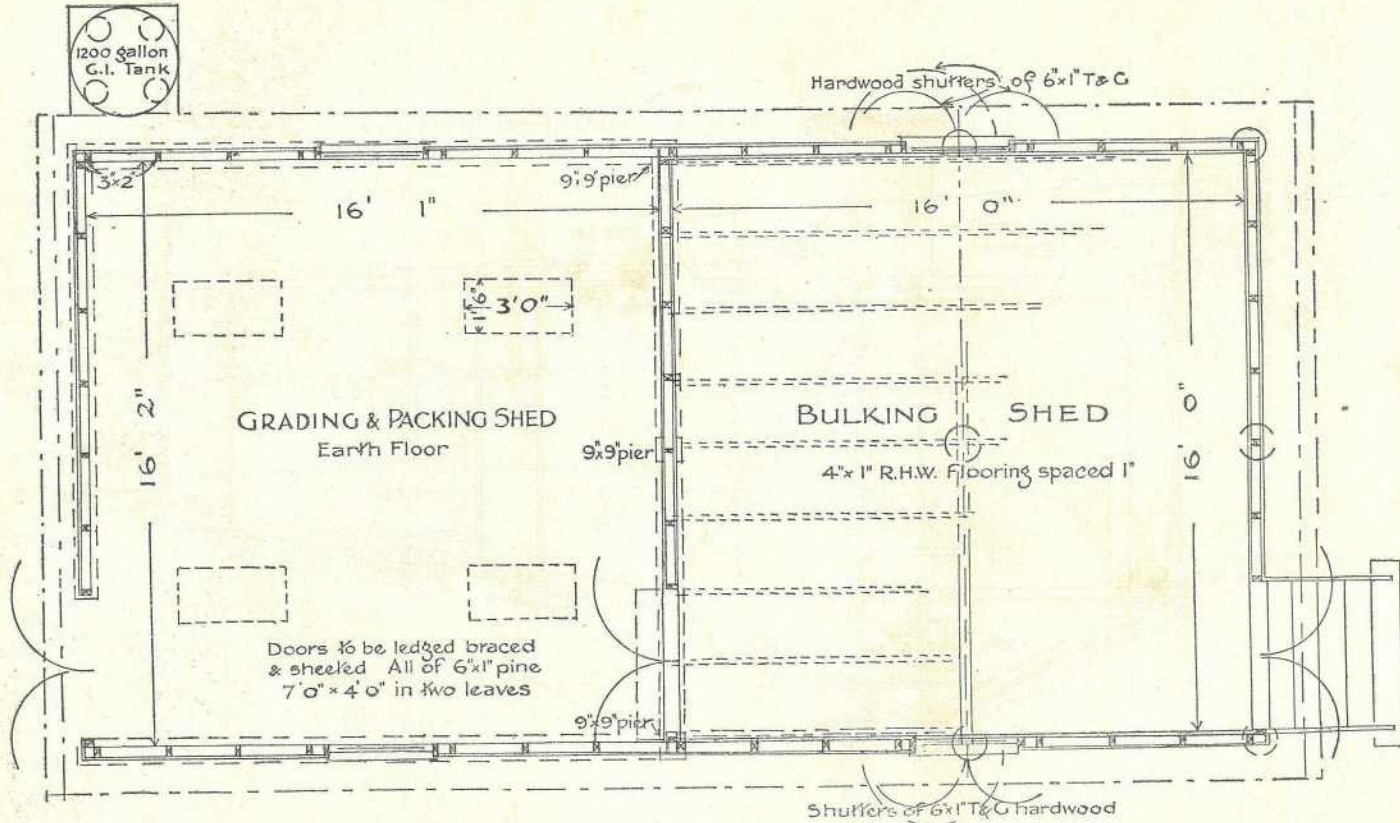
BULKING AND GRADING SHED (GROUND PLAN).
